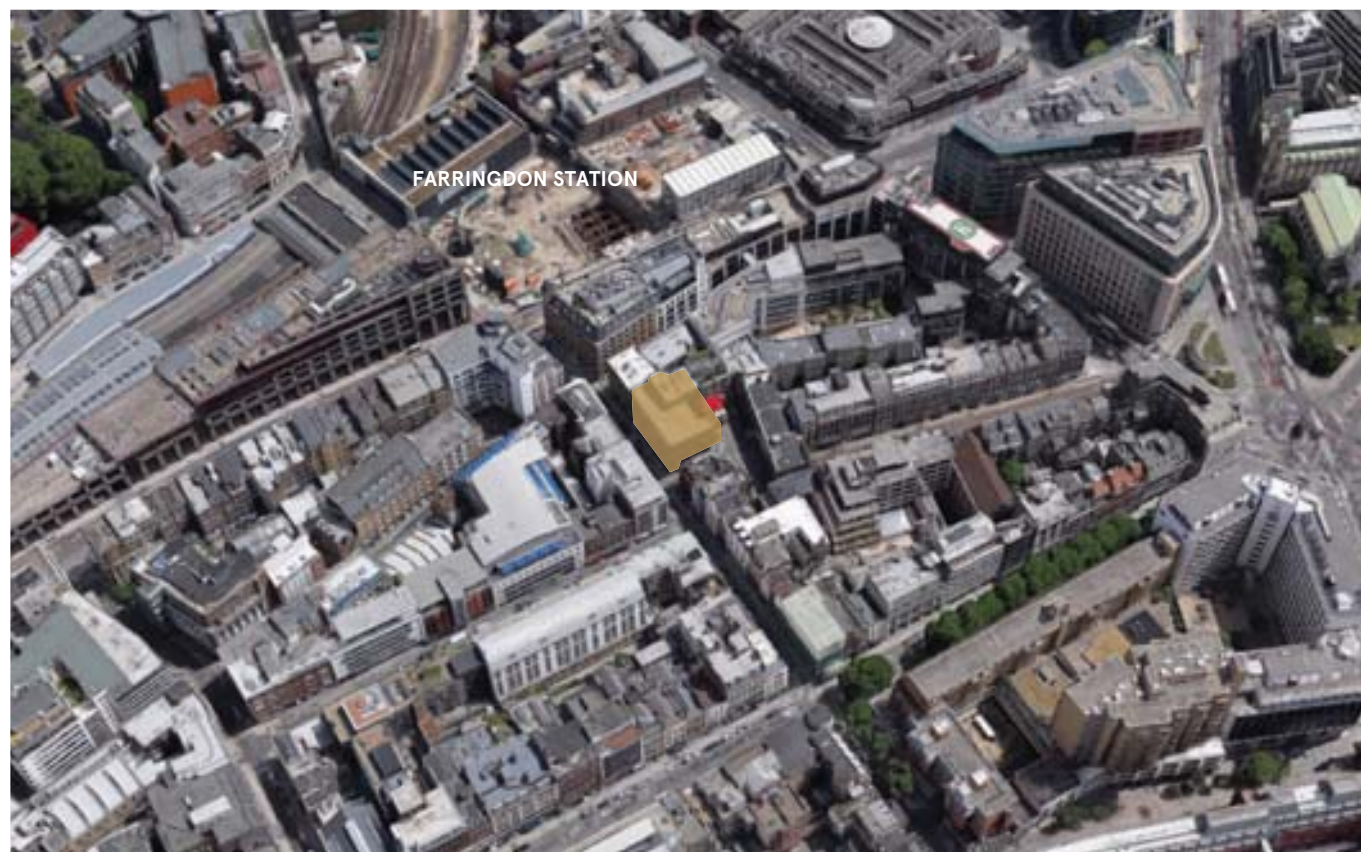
3D Site area plan showing site in immediate surrounding context.
